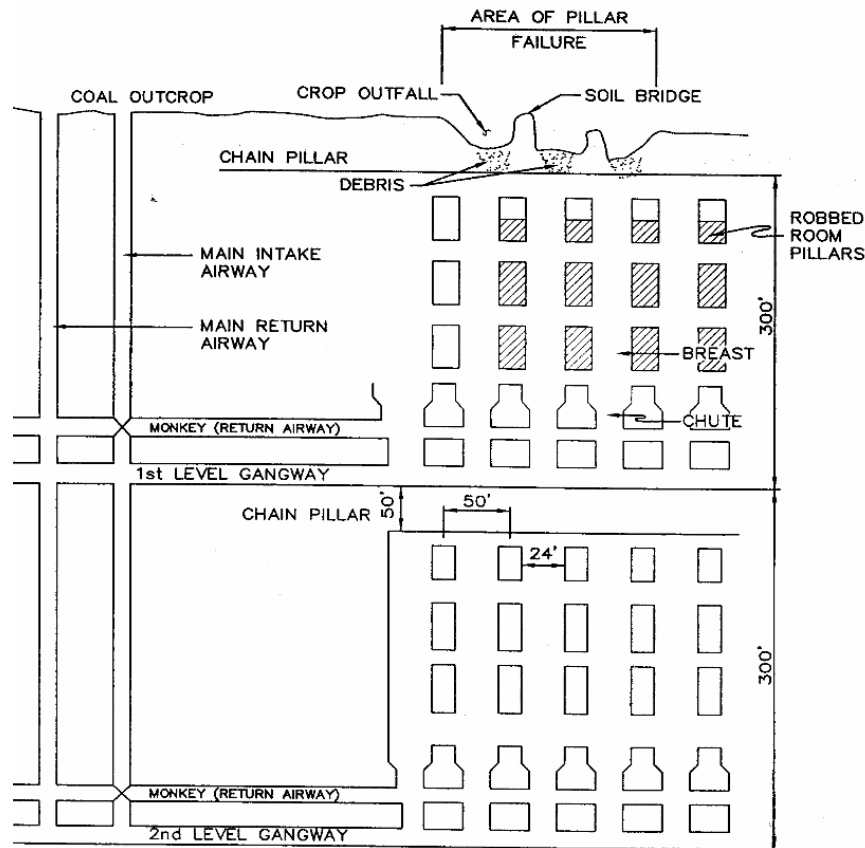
Methods of underground anthracite mining (from Wallace 1981).
